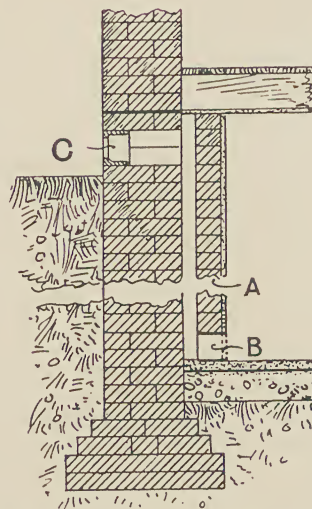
Section showing Inner Wall and Ventilated Cavity for improving Damp Basements. A, new brickwork forming cavity; B and C, air-grates.
